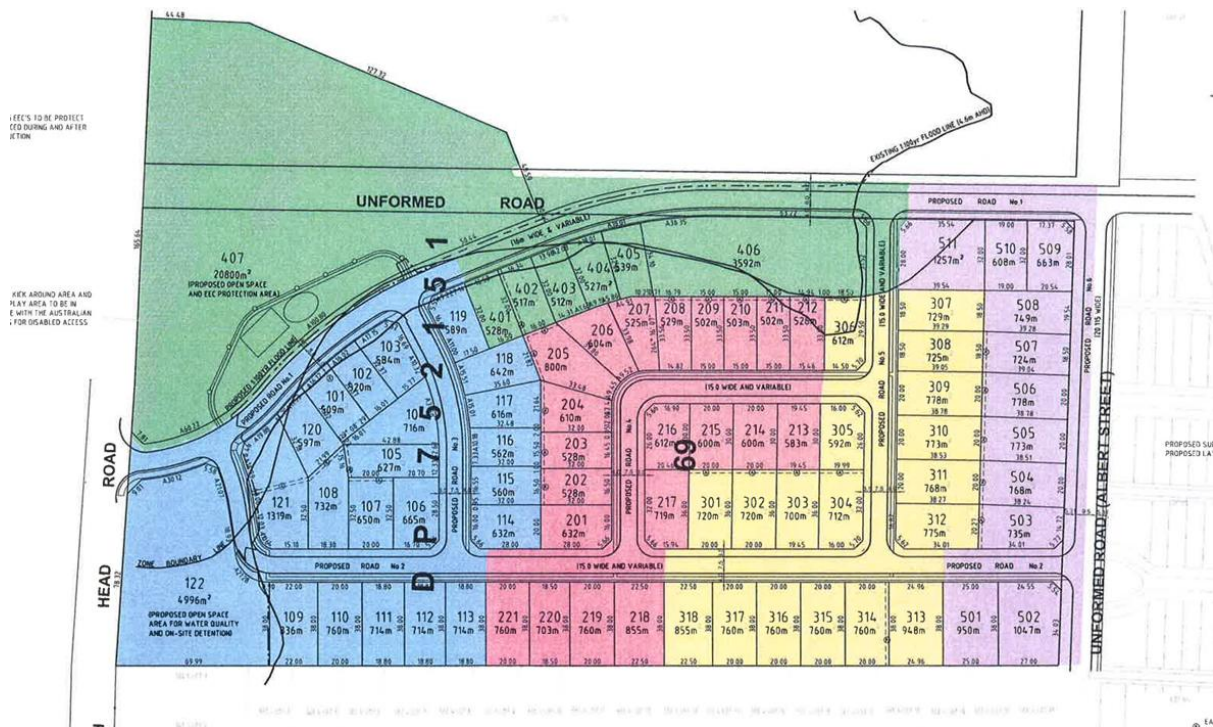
Approved residential subdivision of Lot 69 DP752151 (Extract from approved plans)
